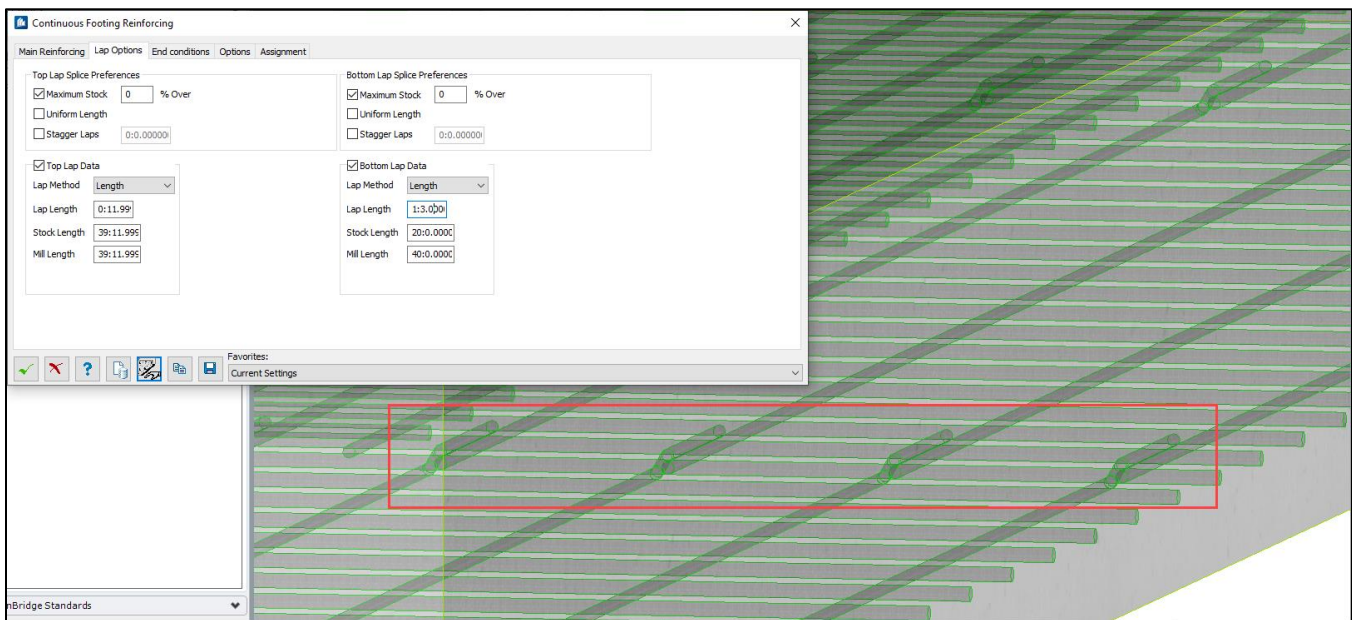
Footing Reinforcement Detailed with Laps
